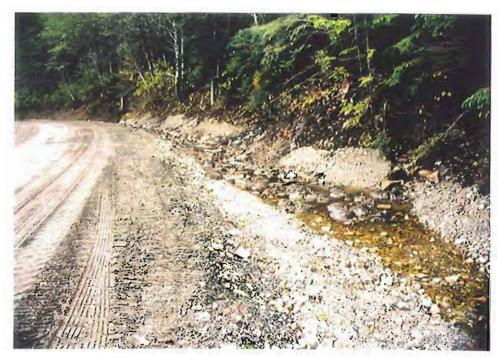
Looking down the nearly completed upland drainage ditch along the Sawmill Creek Road from about Sta. 3+50', showing the substantial water flowing in the ditch, 10/20/99.
